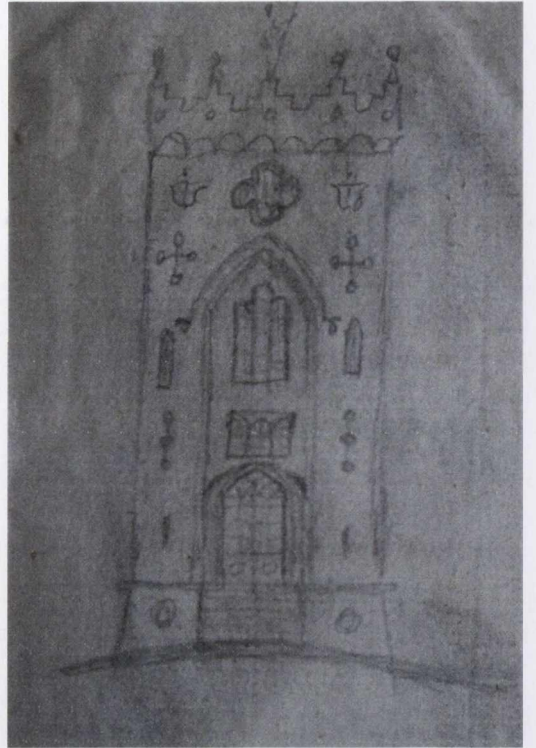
Birr Castle, sketch of proposed gatehouse tower, Laurence Parsons, [1803], Sketch notebook, f. 19r.
